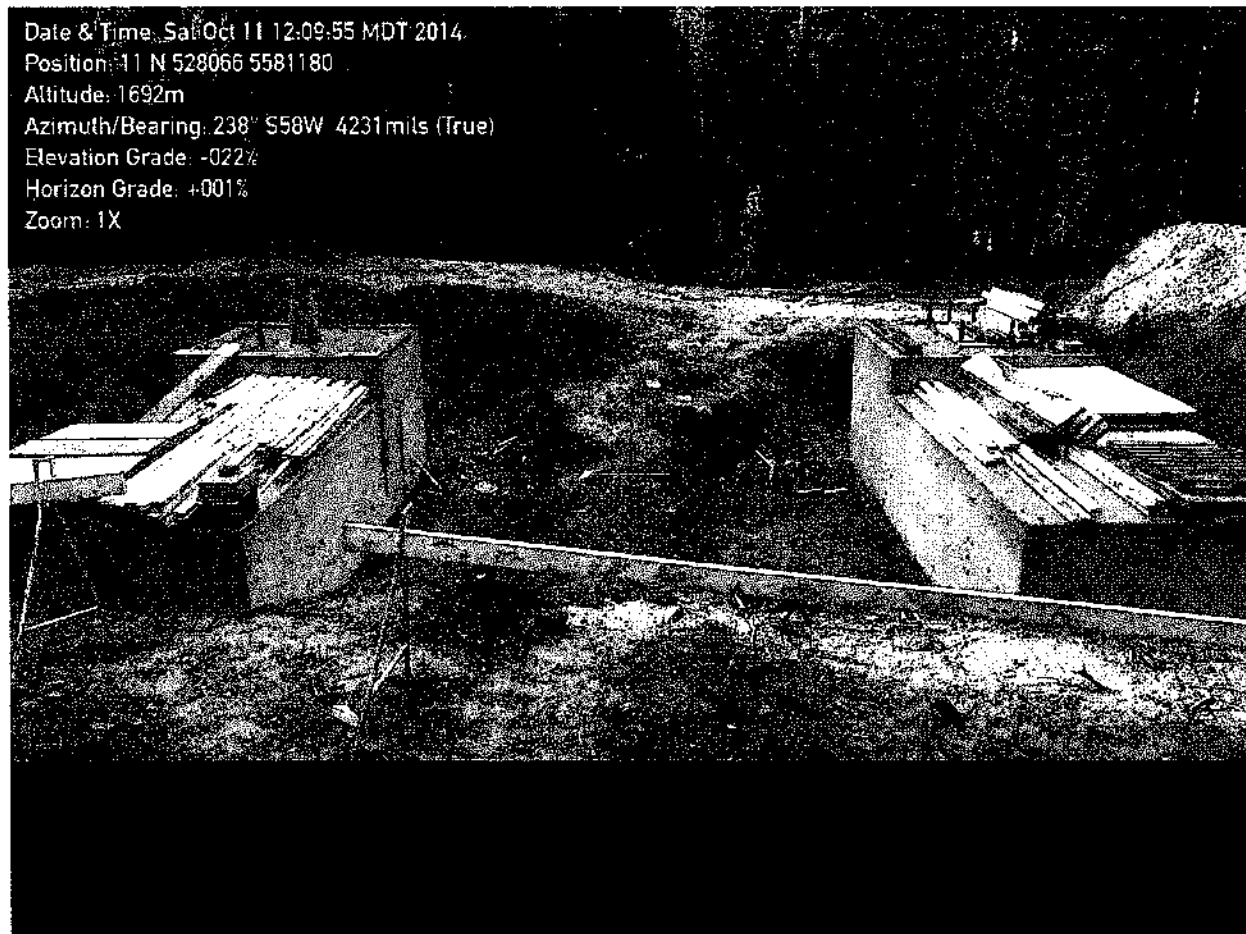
Foundation anchors for a quad chairlift (lift 1.1 of the Master Plan; From EAO Environmental Assessment Office – Substantially Start Site Inspection, October 13, 2014).
